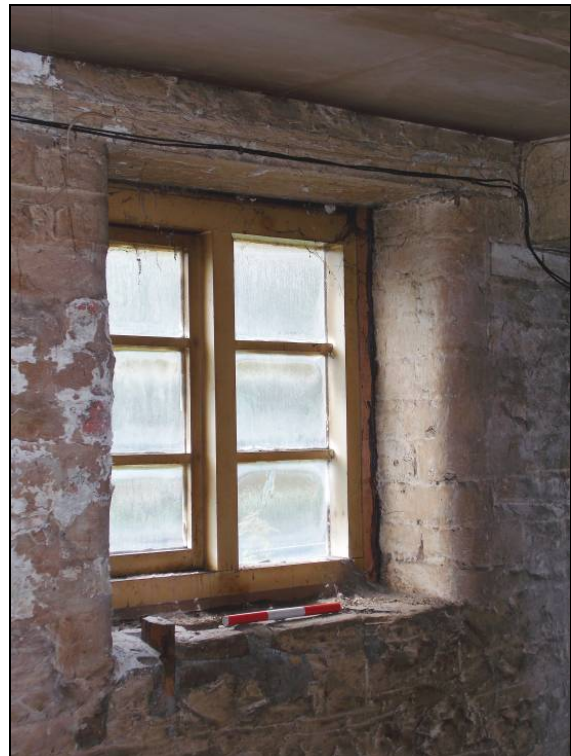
Detail of window opening within the north wall, looking south-west (scale 300mm).
